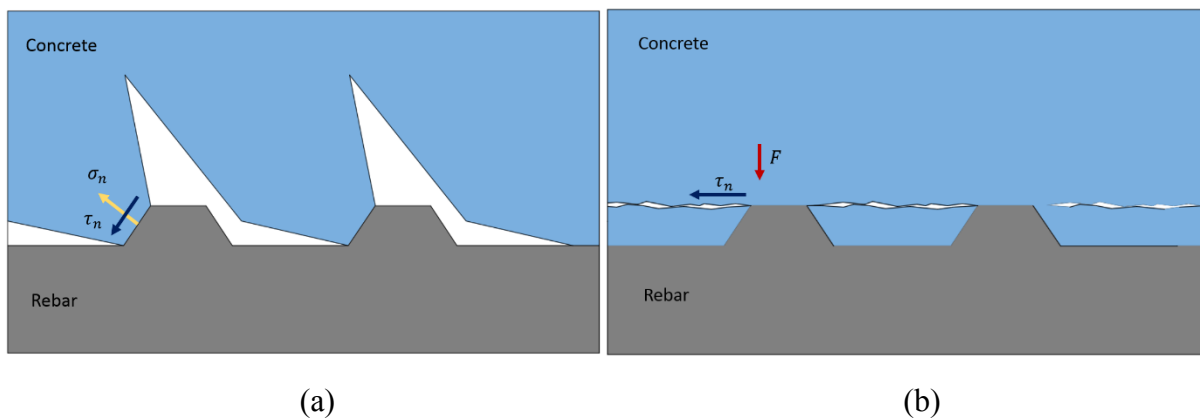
(a) Splitting Failure Mechanism (b) Shear Failure Mechanism at Steel-concrete interface
